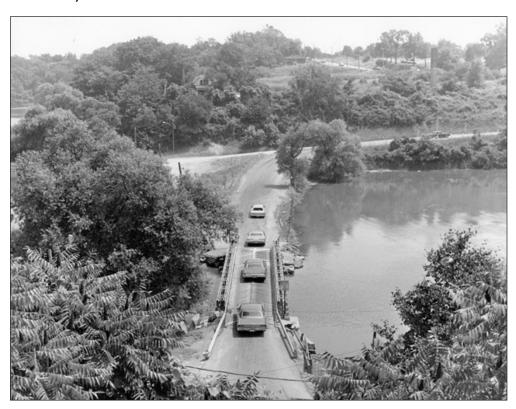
Valley Inn Bridge looking southeast 1973 (Source: Hamilton Public Library, Local History & Archives)
